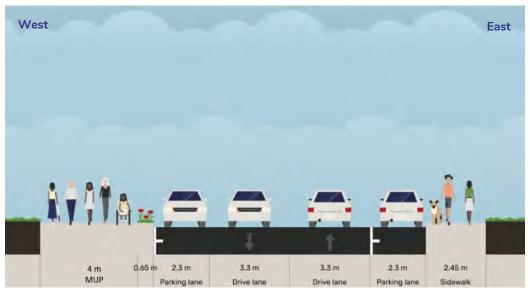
Recommended 4th Street Cross-Section Between A Avenue and Front Street
